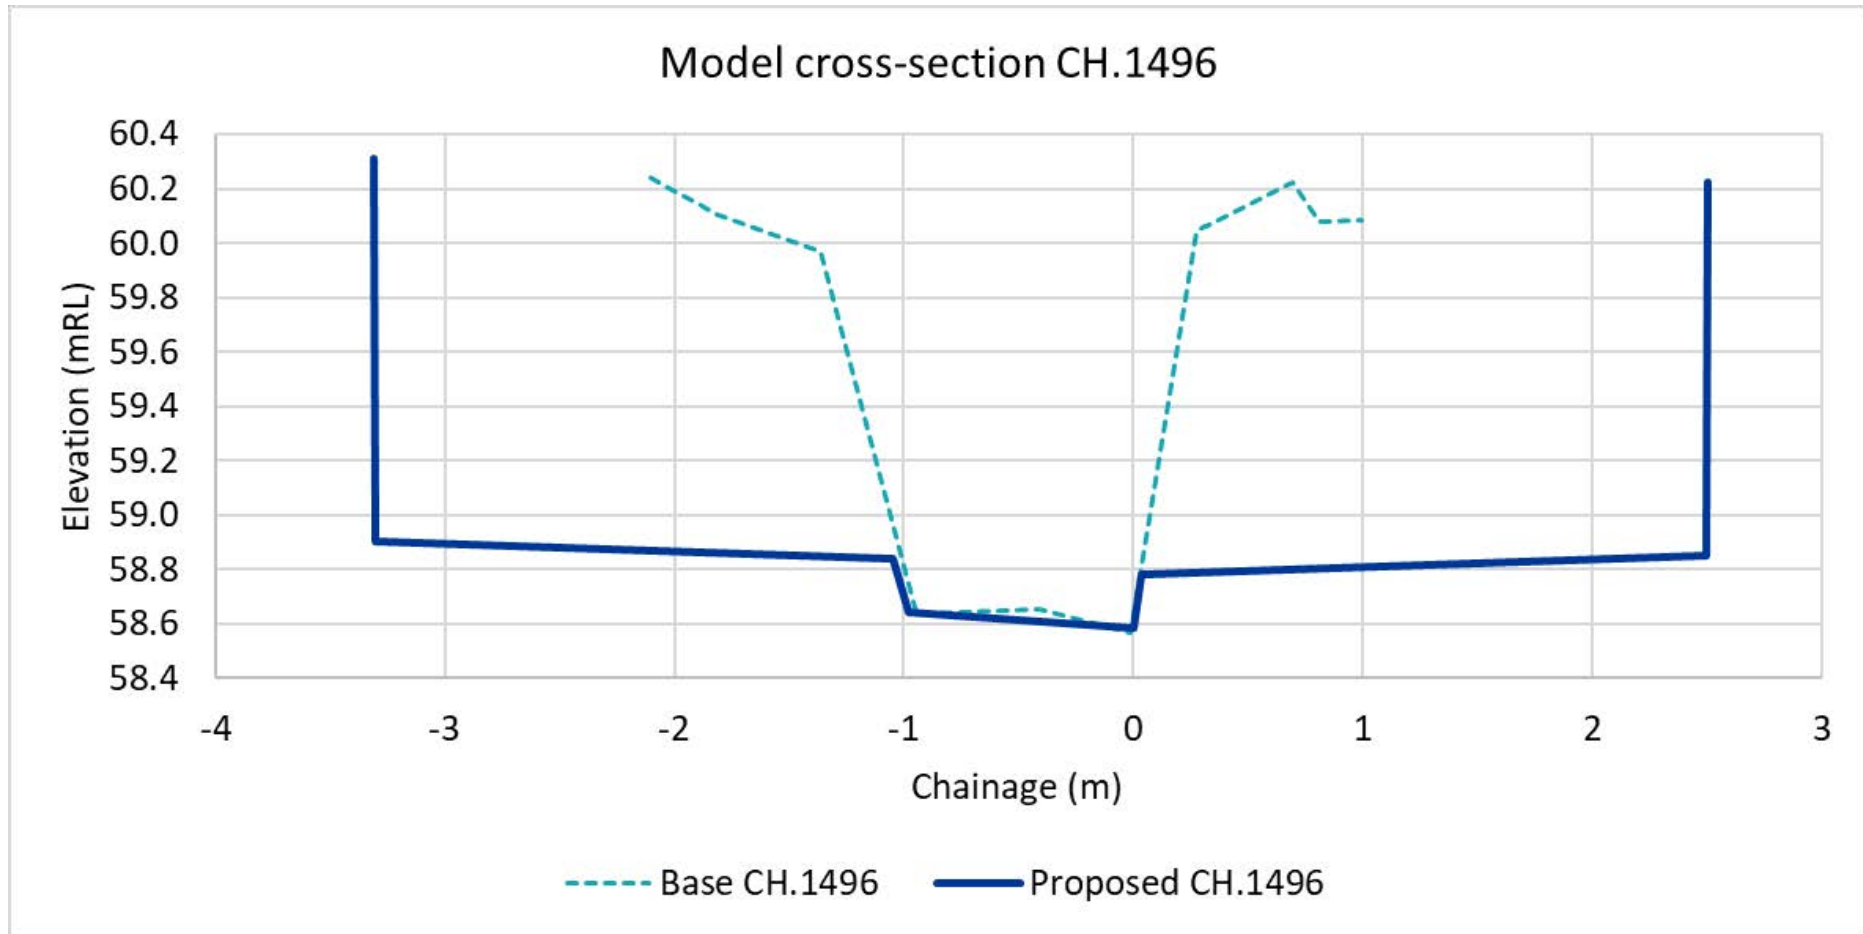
Cross-section 1496 (proposed as per June 2020)
